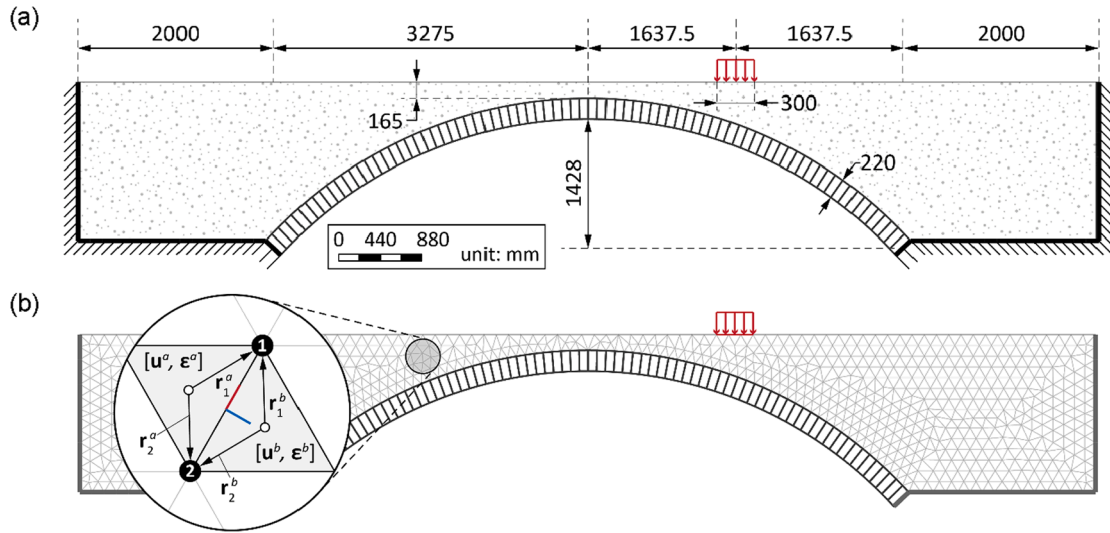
Modeling of Prestwood Bridge: (a) geometric characteristic; (b) backfill modeling, external load and boundary conditions.
